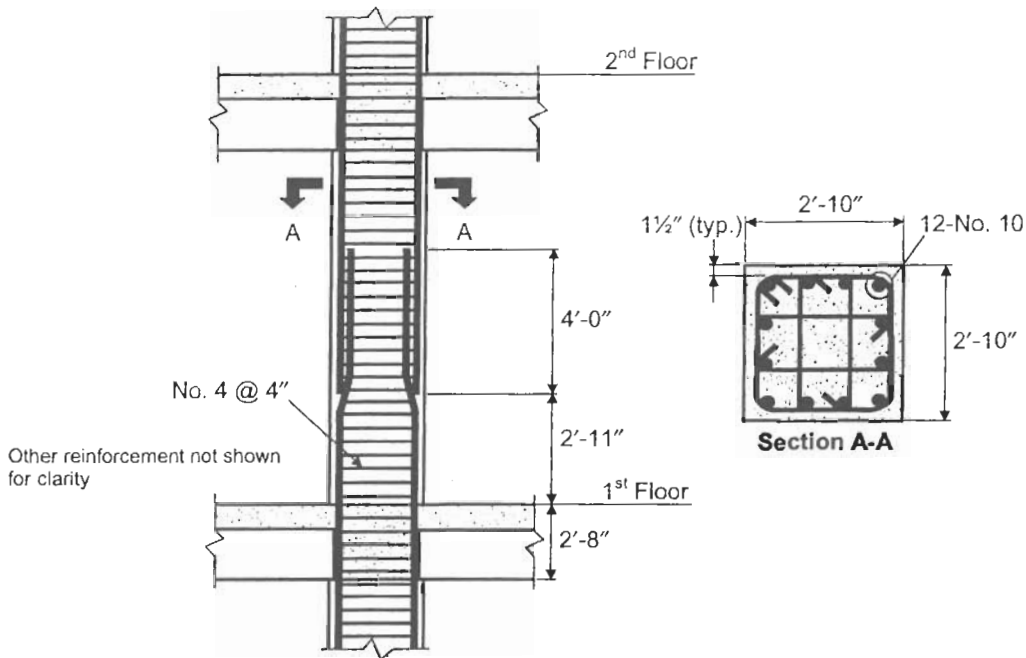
Reinforcement Details for Column C4 Supporting the 2<sup>nd</sup> Floor Level (SDC E)
